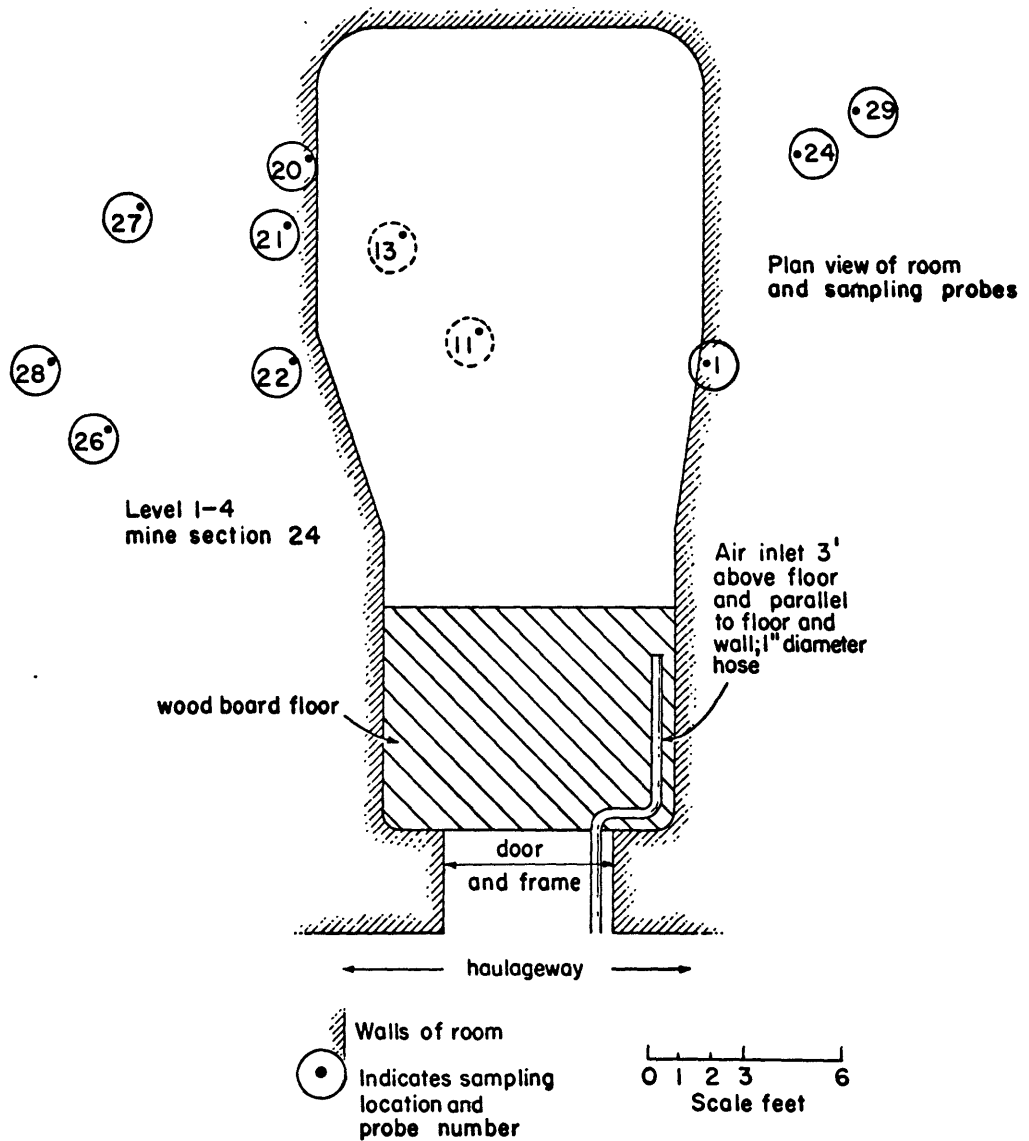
PLAN VIEW OF SAMPLING INSTALLATION FOREMAN'S ROOM
